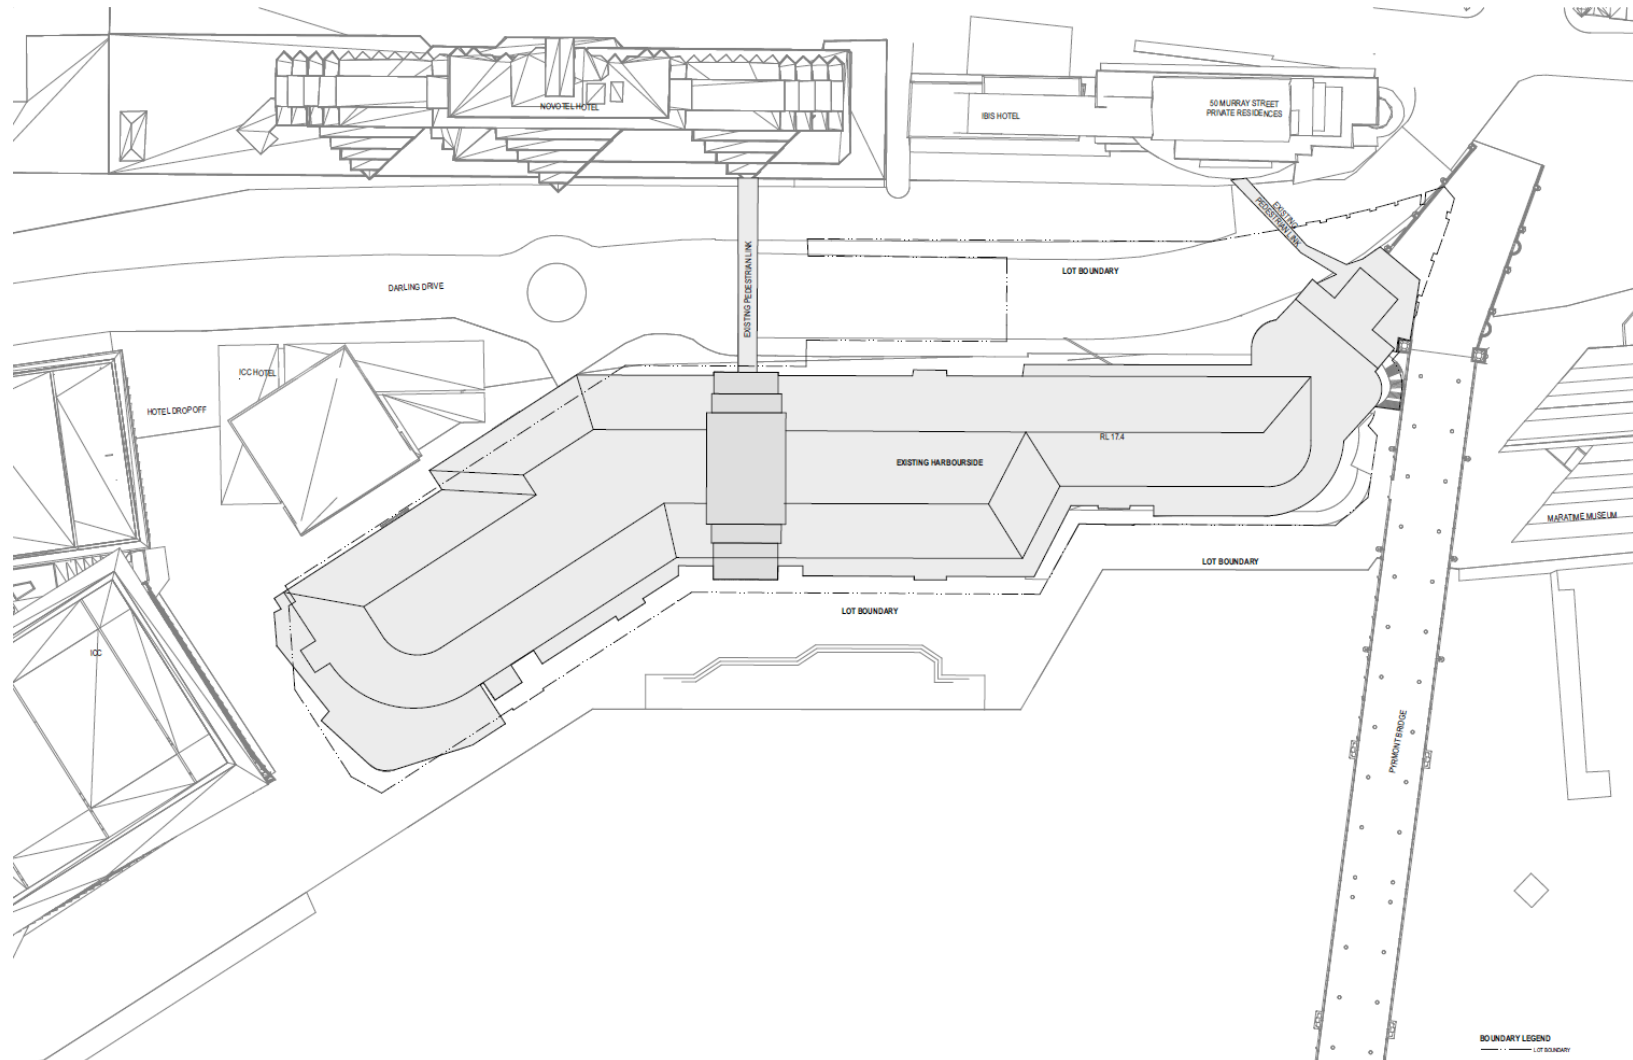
Existing Plan (Source: FJMT, 2020)
